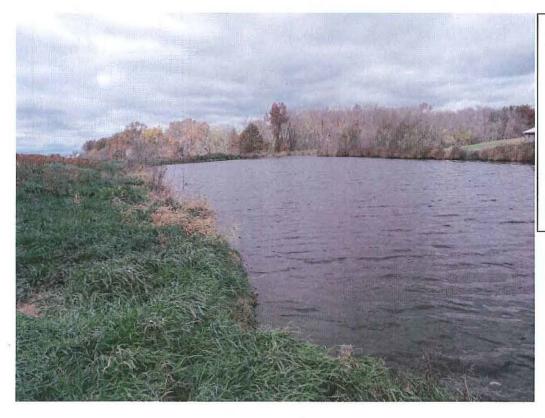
Facing west. South side of Stage 2 manure storage pond.
